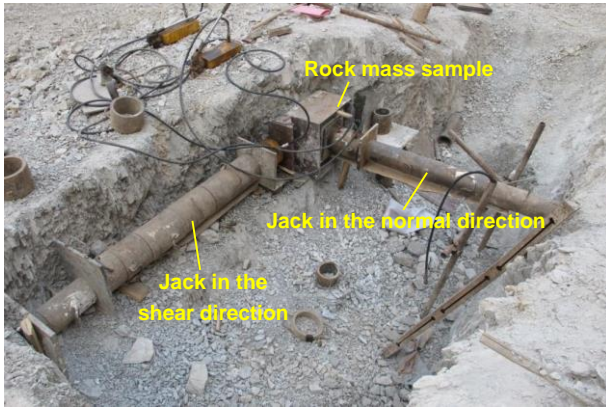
Layout of rock mass sample and test equipment in the test pit
